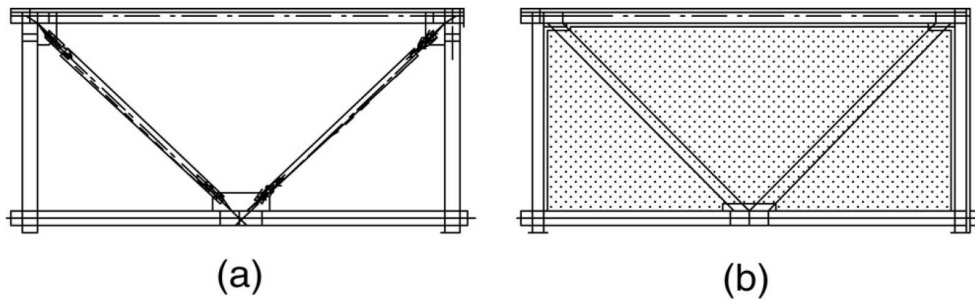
Two categories of BRBs: a) Steel brace encased by RC or steel element and b) Steel braced encased by concrete panels [1]
